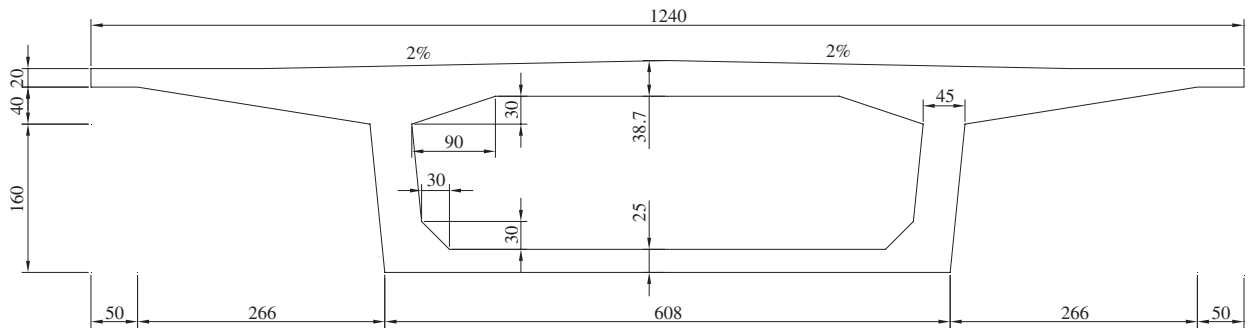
Cross-section of the 24 m-span beam (unit: cm).
